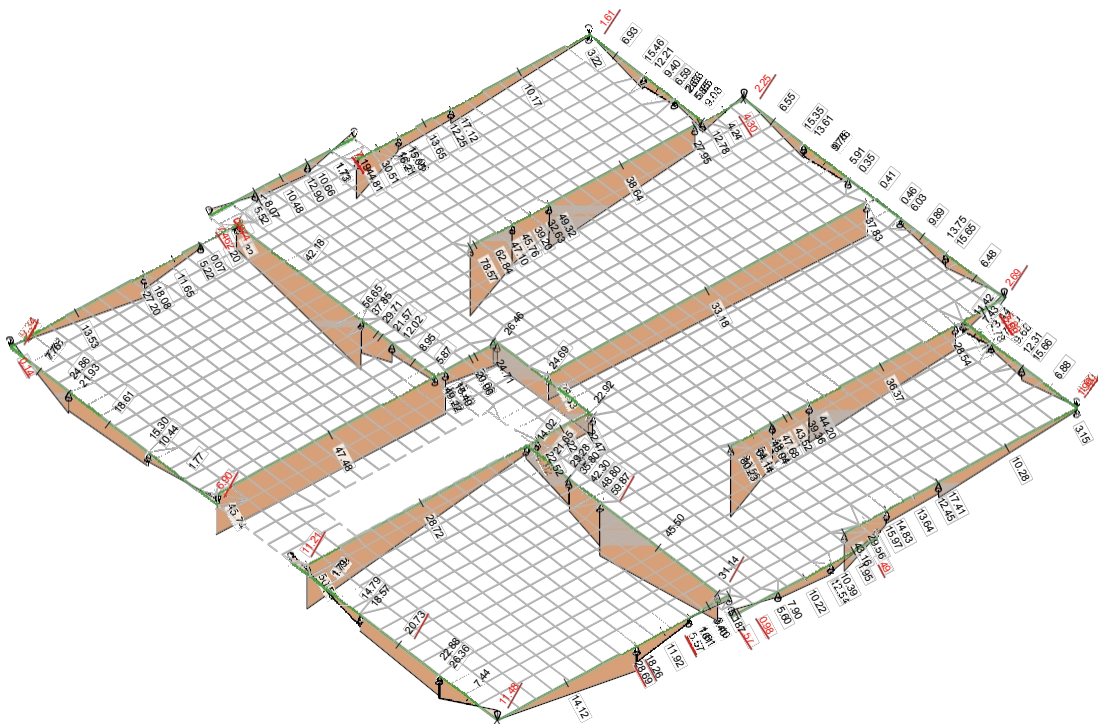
Linearised max. support forces of the ceilings on the ground floor - 3rd floor from the load cases  $g + q$
